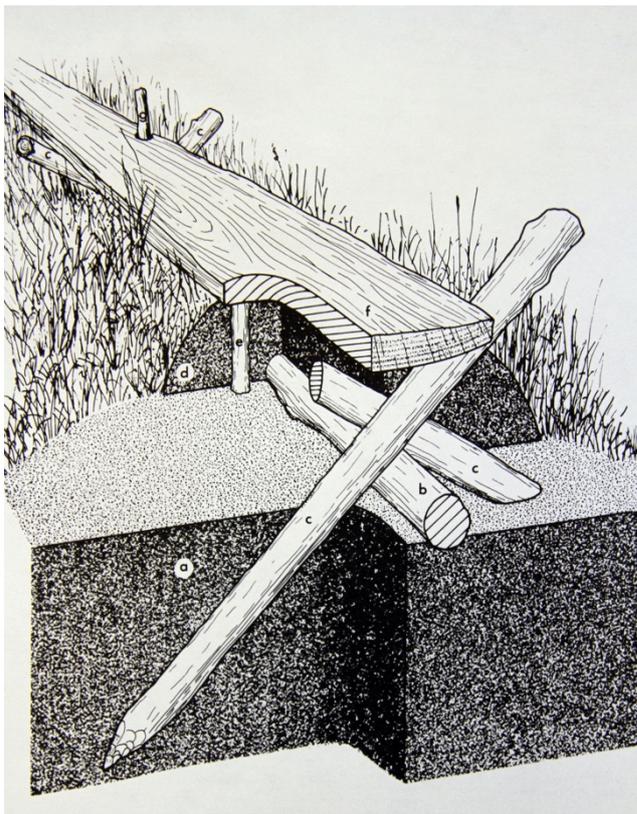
(left): Reconstruction drawing of the typical Sweet Track design by the SLP, with (a) underlying peat, (b) foundation rail, (c) rail pegs to hold it place and support walkway plank, (d) occasional use of peat packing, (e) supporting plank peg with resting plank above (f) plank, (g) plank peg through cut notch to hold plank in place (Coles & Orme 1976, 39)
